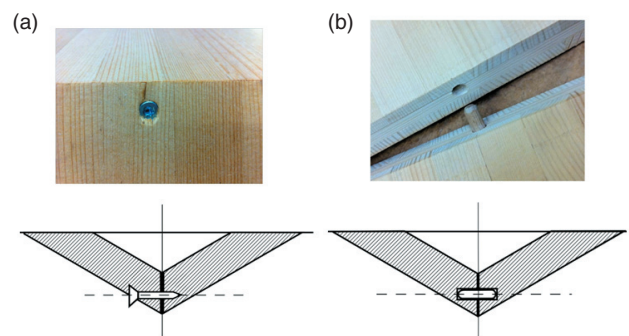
Mirrored panels connection fasteners: (a) Oval head screws (b) wooden dowels inserted in prefabricated holes.
